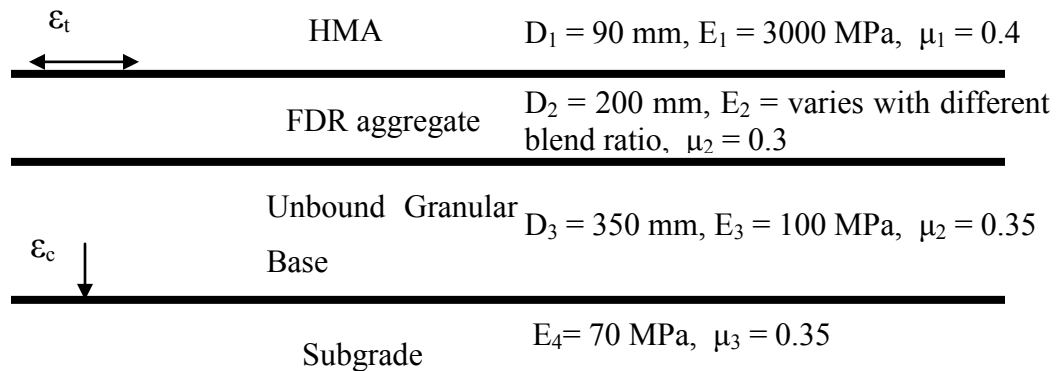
A Full Depth Reclaimed new pavement with four layers for Route 335 and Route 790
